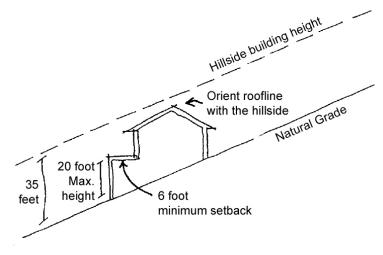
E.2.c Downhill Building Step Back
